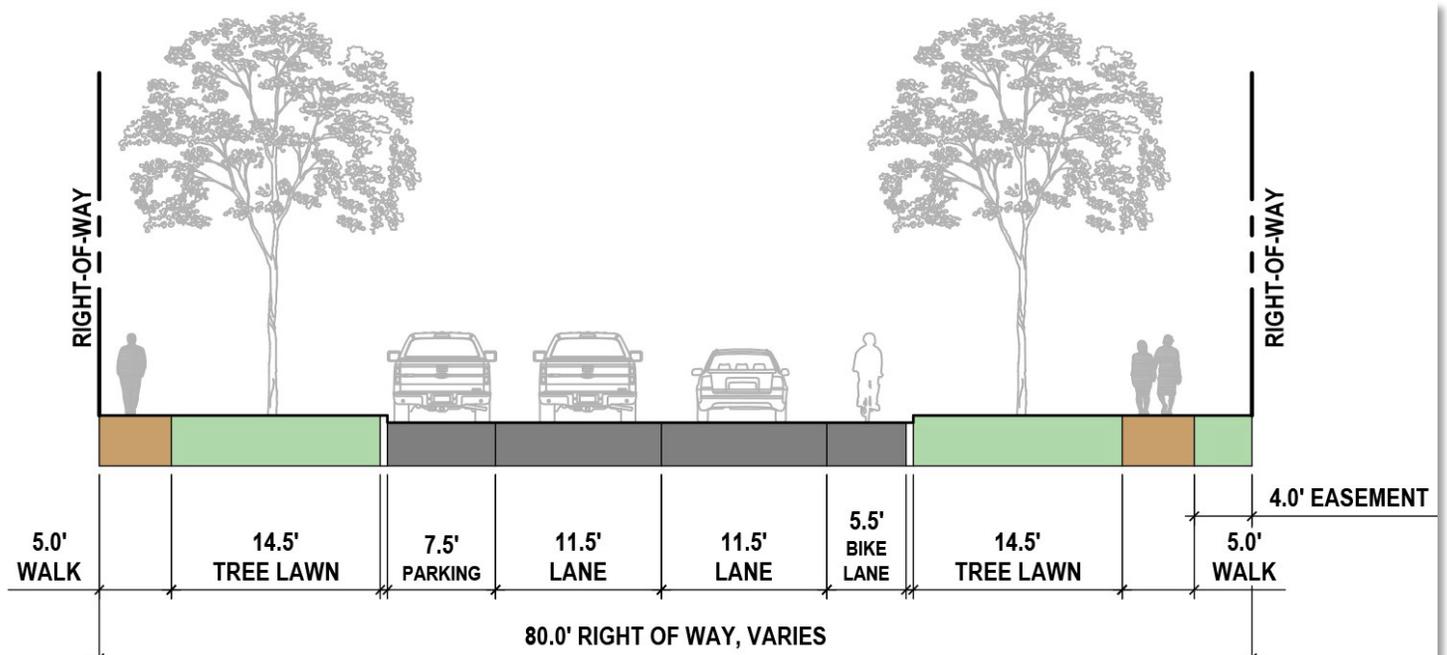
5th St - Existing Cross-Sections Between Grand Ave & Belford Ave
